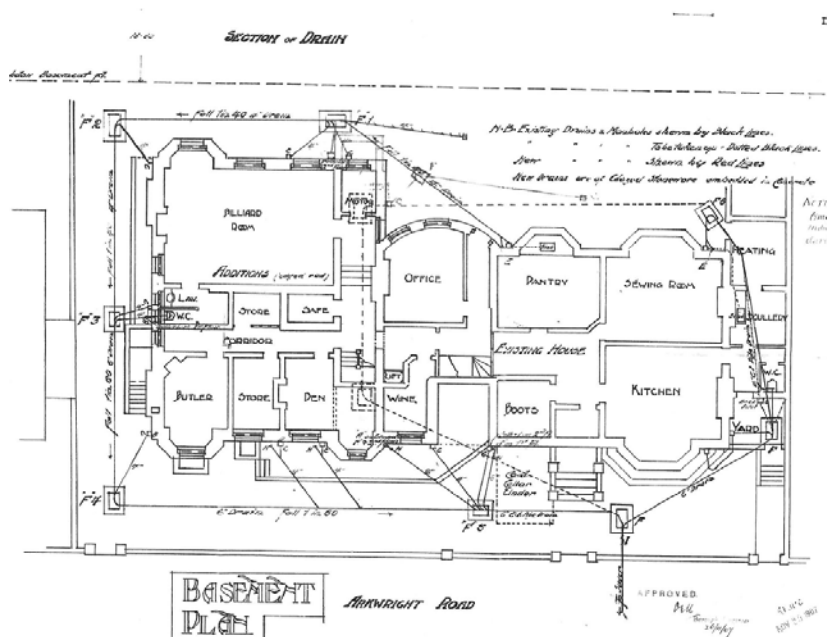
Basement Floor Drainage Plan, no.9 Arkwright Road, Hampstead, London, 1907 (London Borough of Camden Local Studies and Archives Centre)
